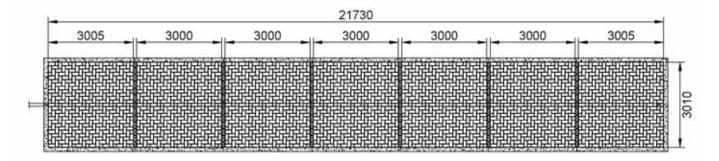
Layout of the test pad. Dimensions are shown in mm.
